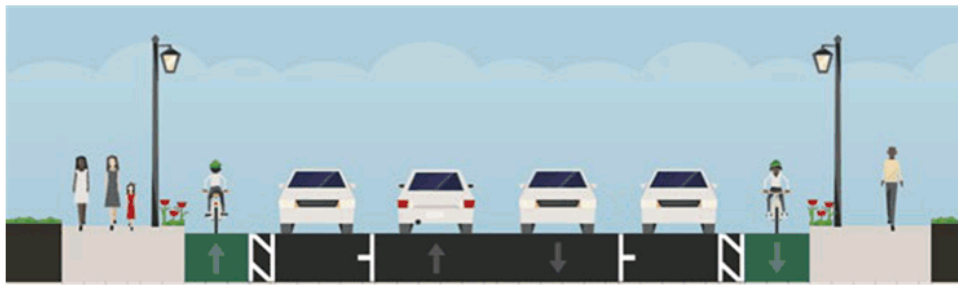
Alternate cross section of Vincent Street (slow speed mixed traffic).
